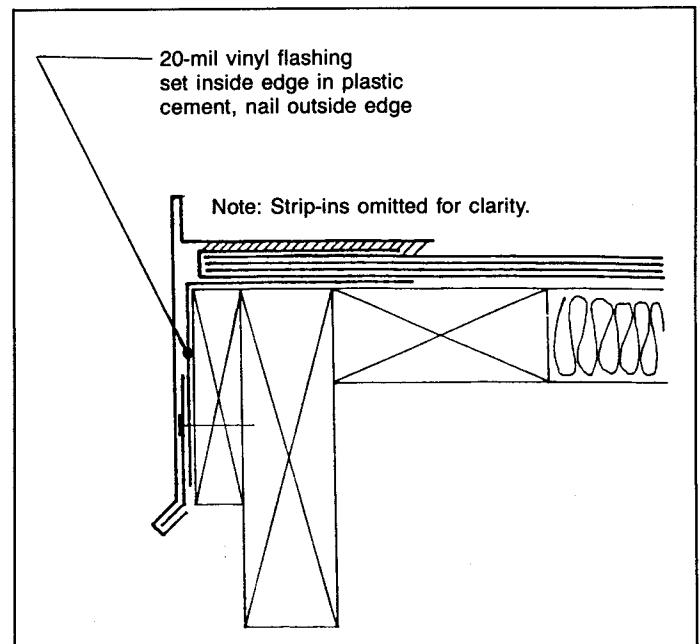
Gravel stop section showing redundant additive (Courtesy of Bradford Roofing and Insulation, Billings, Mont.)
